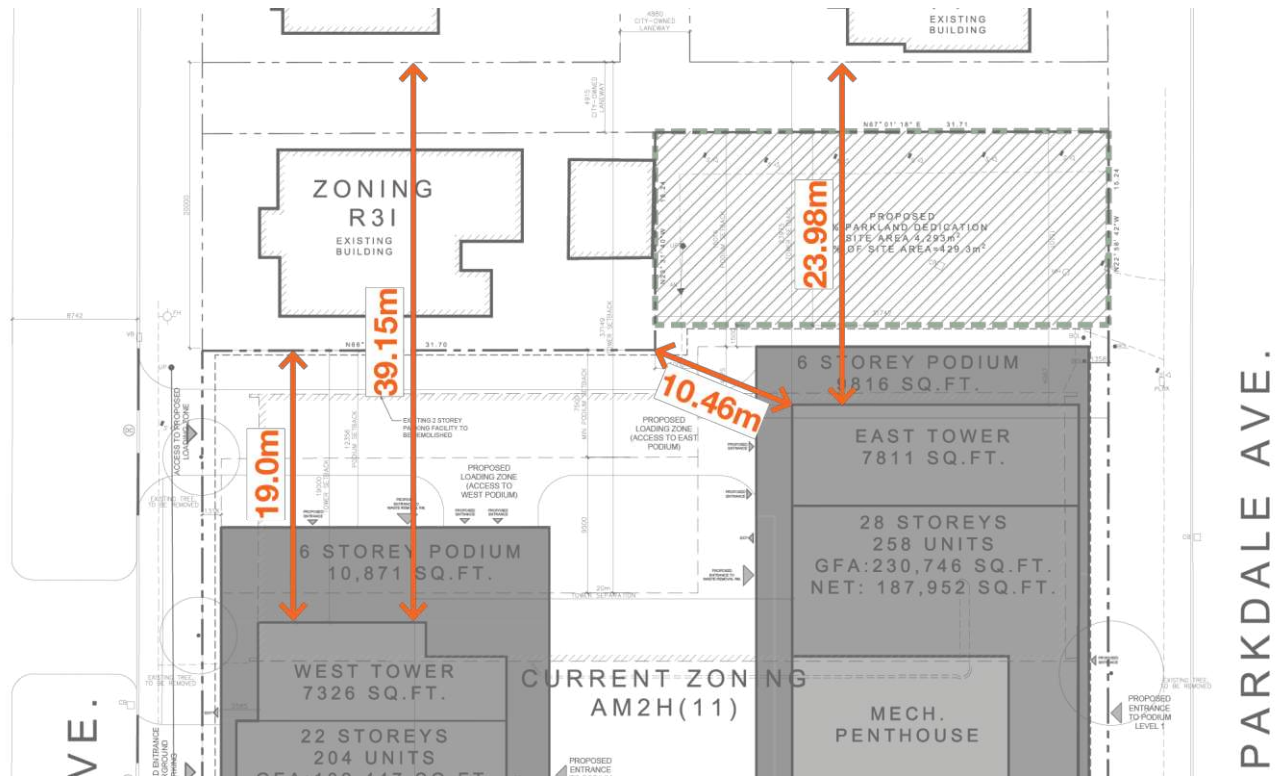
Proposed Tower Transition to Adjacent Low-Rise
